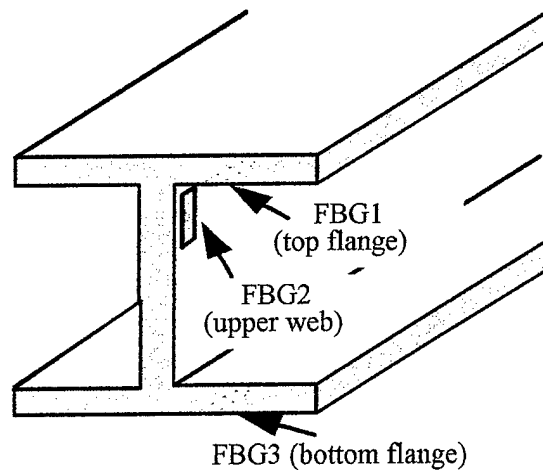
Local arrangement of the FBG sensors at each girder location. Sensors were placed on the top flange, the web and bottom flange of the girder.
